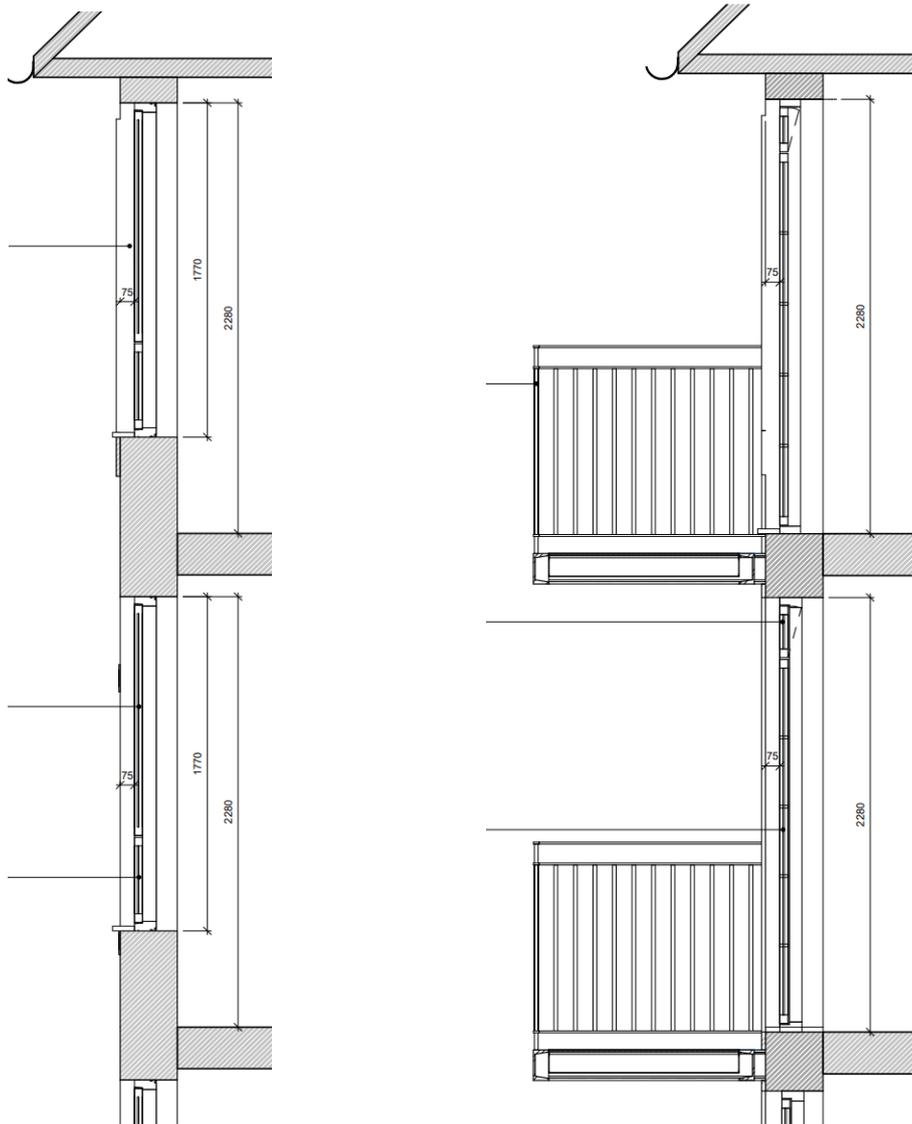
and 10: Proposed street-facing window sections (left image) and proposed balcony door sections (right image)
